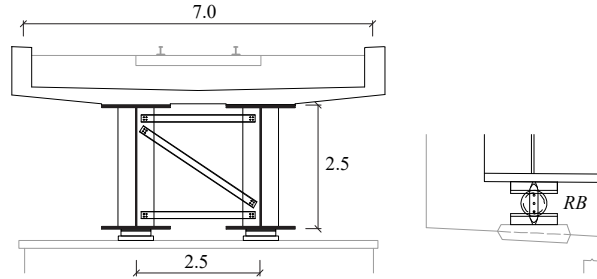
Left: cross-section of the bridge, steel girders and concrete deck, right: detail of the roller bearing.
